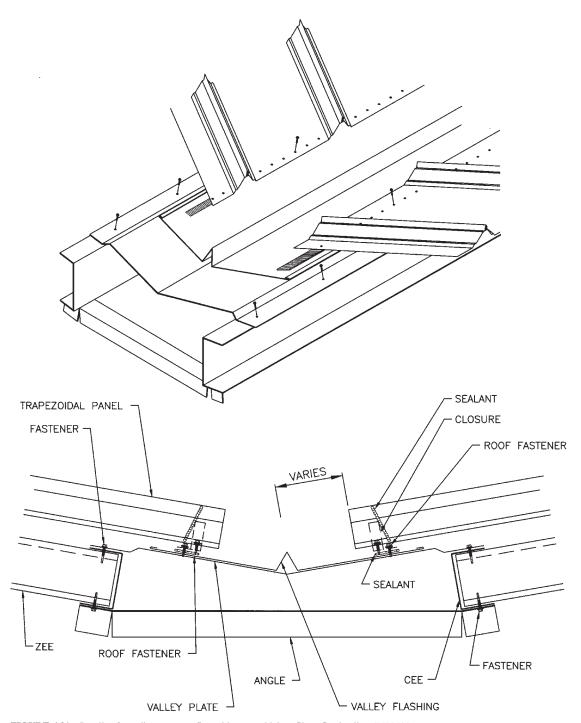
Details of standing-seam roofing with trapezoidal profile at fixed valley. (MBMA.)
